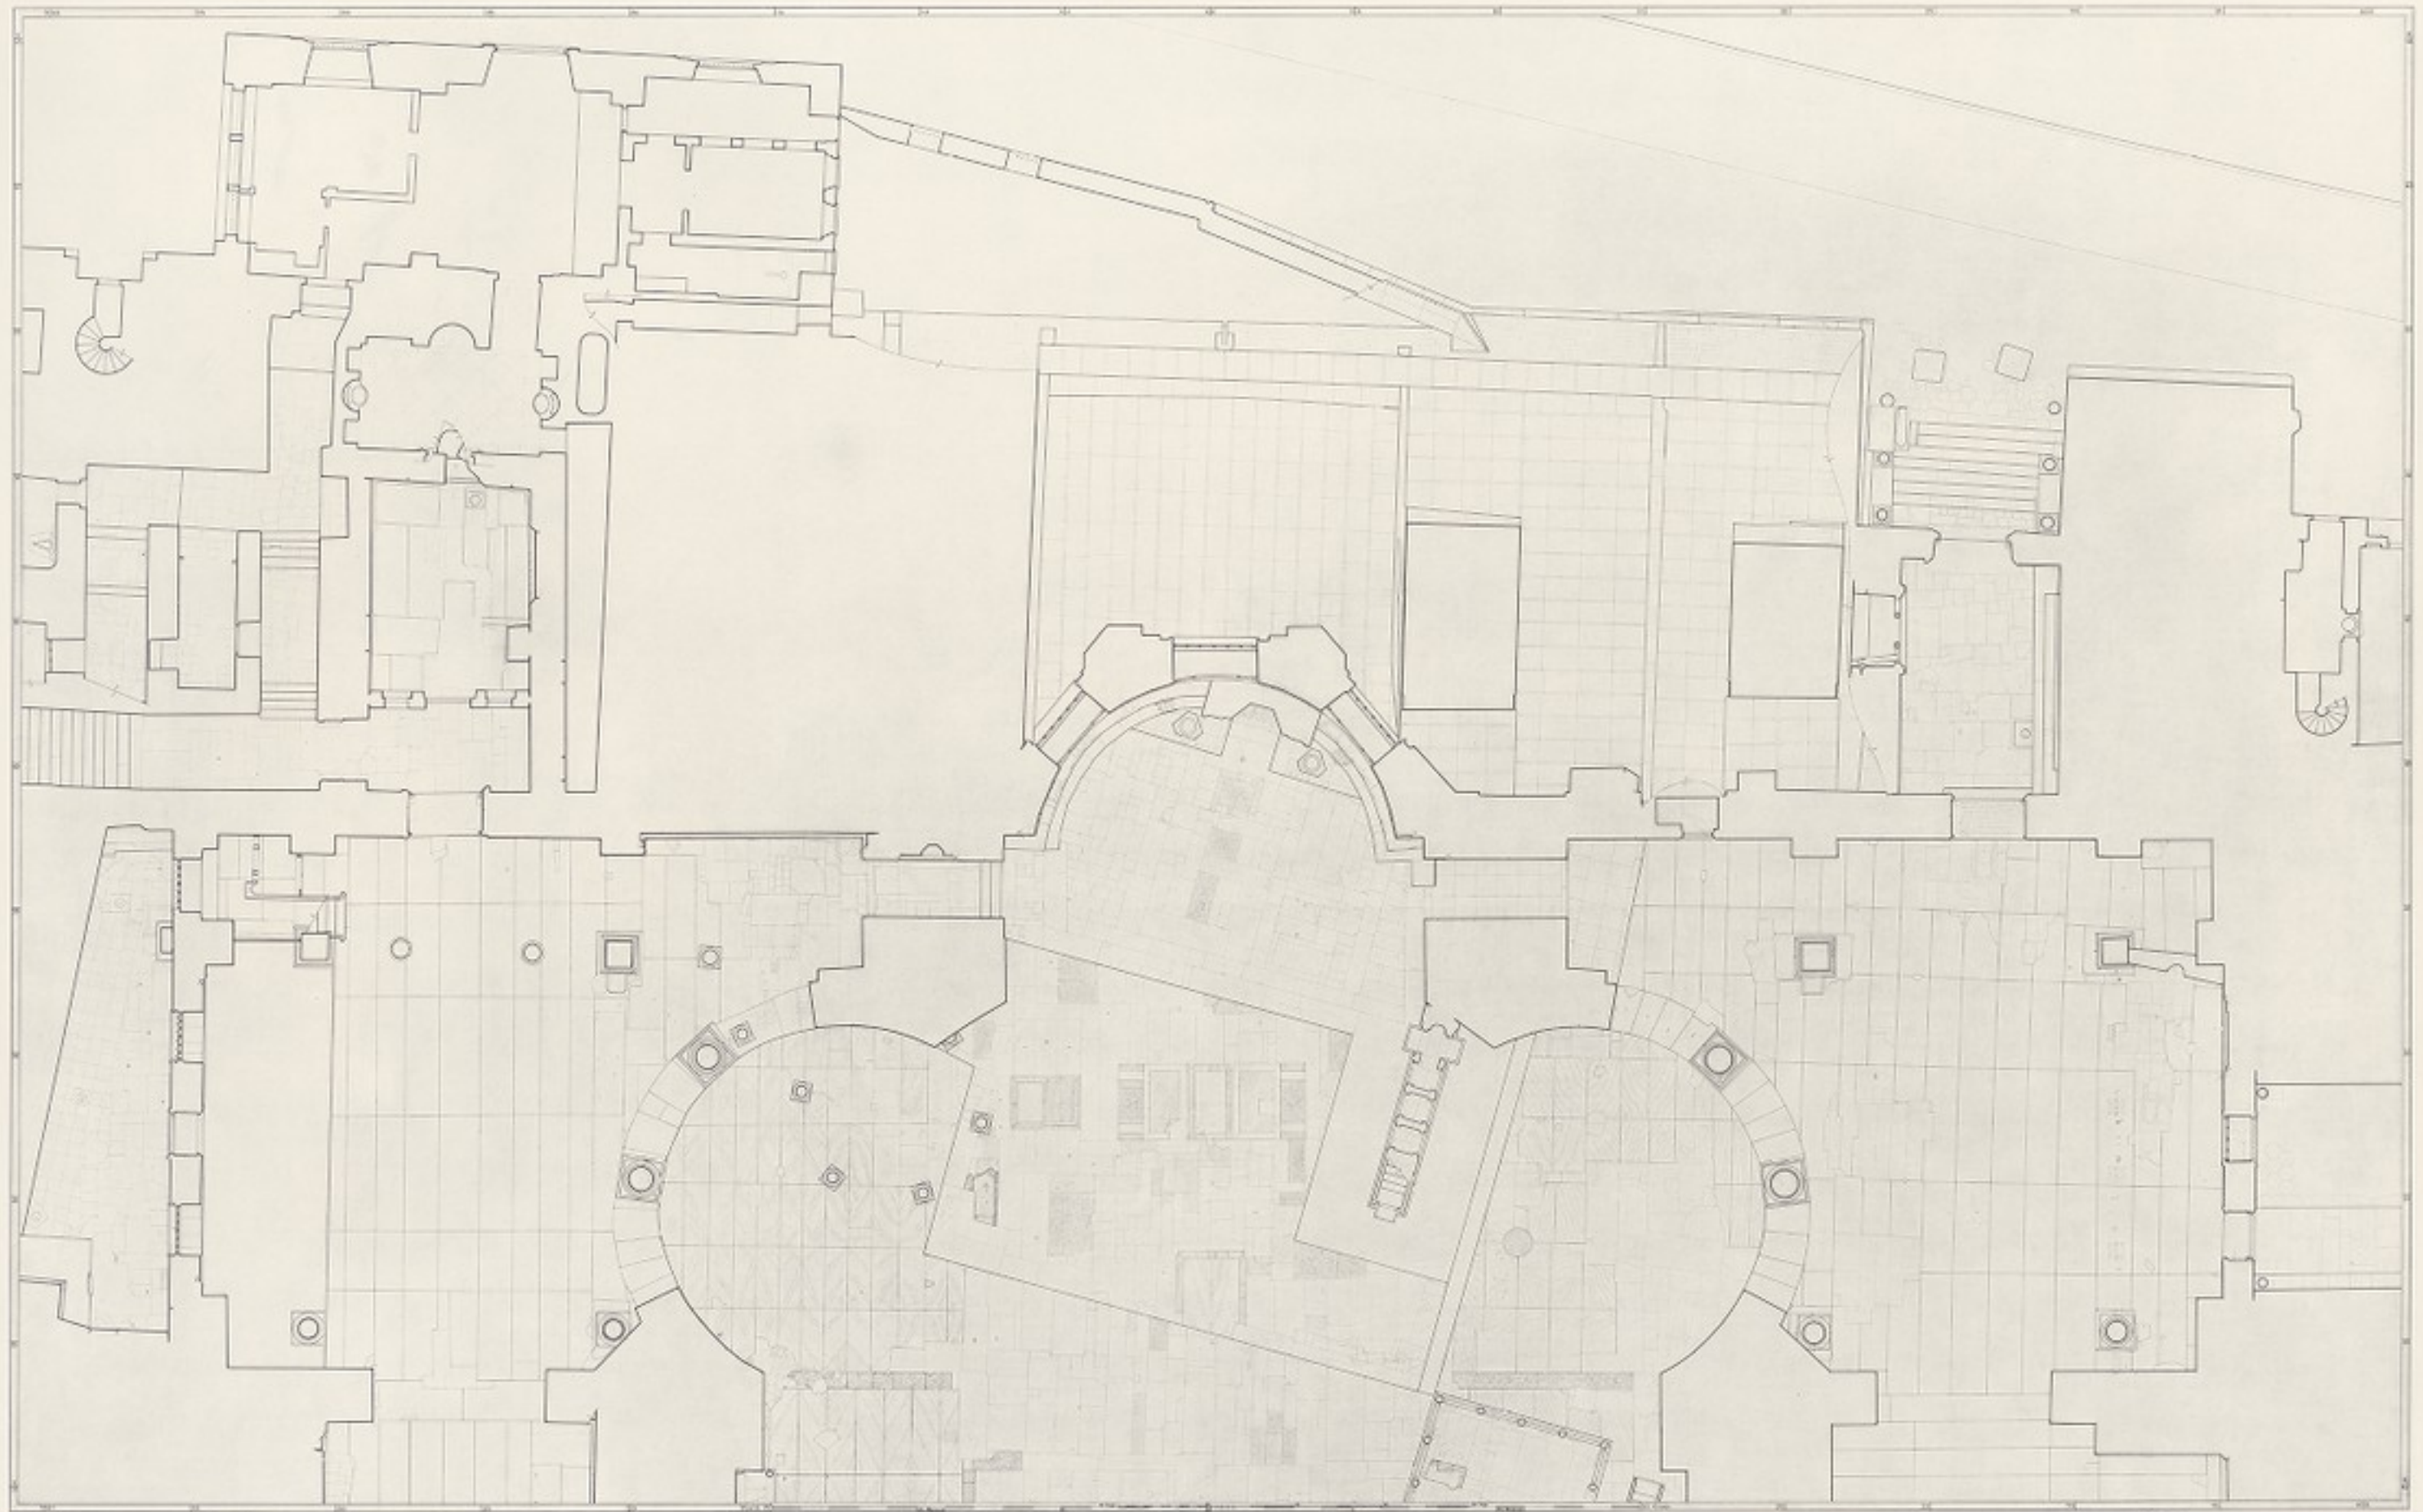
PLAN AT GROUND LEVEL, EASTERN AREAS:
